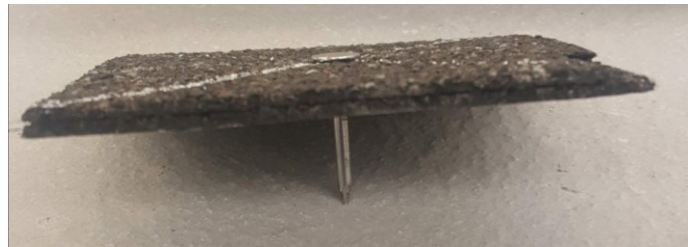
Fastener placement in the shingle fastener pull-through specimen
